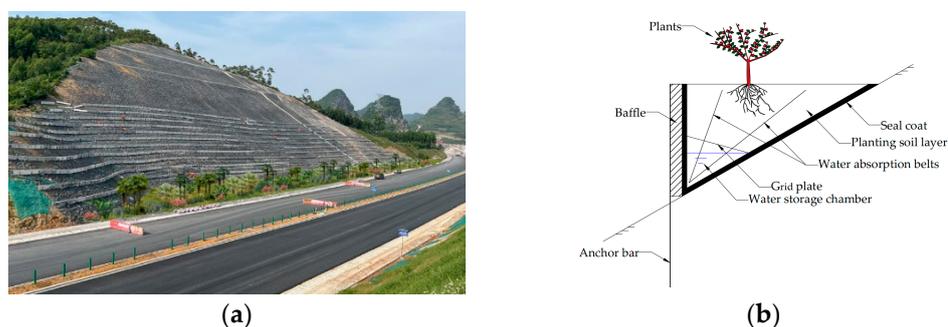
Slab trench arrangement and detailed structure: (a) In situ construction of stepped slab trench on the rocky desertification slope; (b) Profile of the slab trench.
